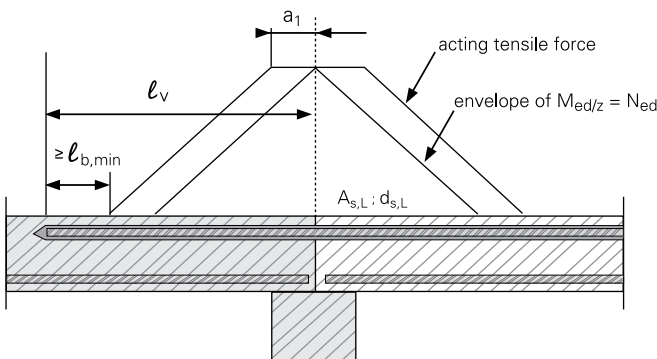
Anchoring of reinforcement to cover the line of acting tensile force.
